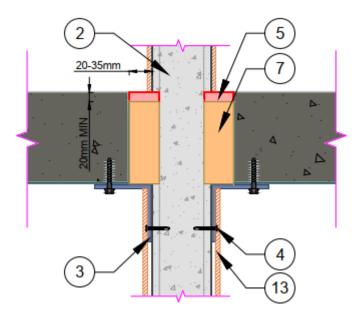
Dual wall system with vertical wall between horizontal walls – gap width of 20-35 mm between the stair and vertically oriented wall
